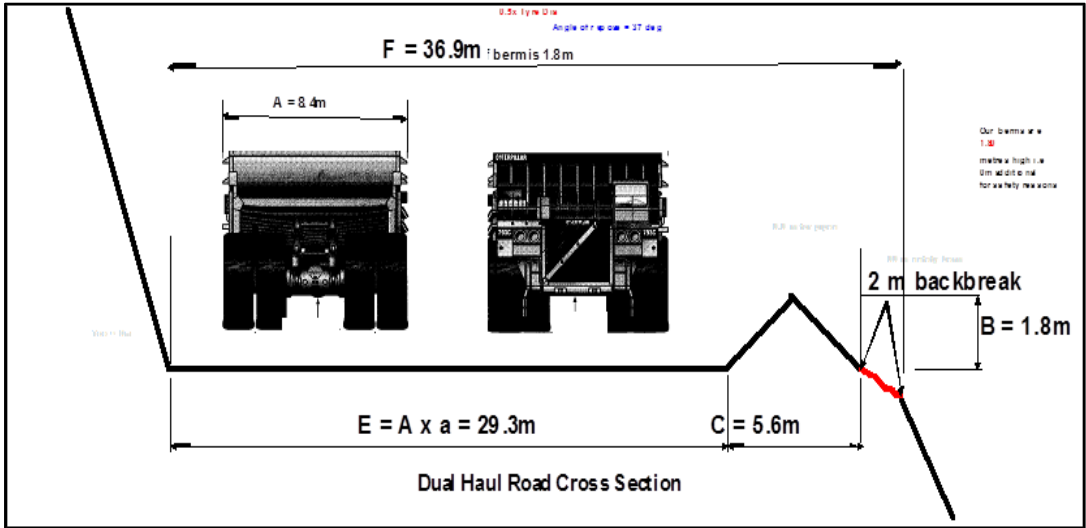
A typical haul road design for a 793 CAT truck (Venetia Mine, 2010).
